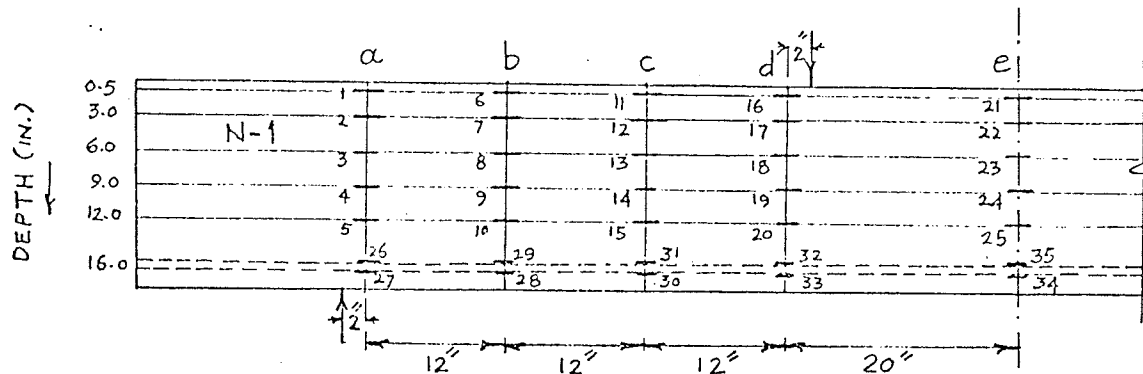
GAUGE LOCATIONS ON BEAM IB-4
